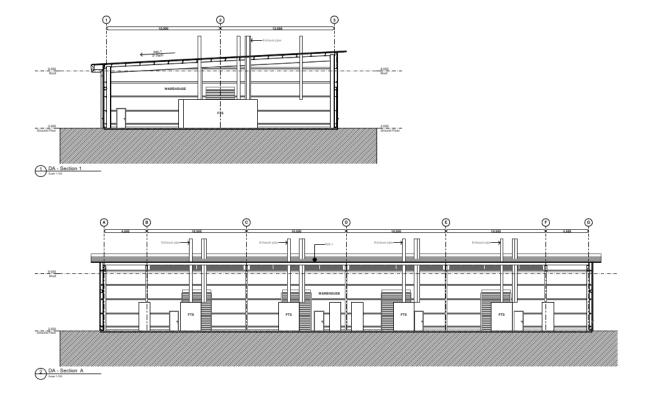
Sections Building Elevation (Source: With Architecture Studio)
